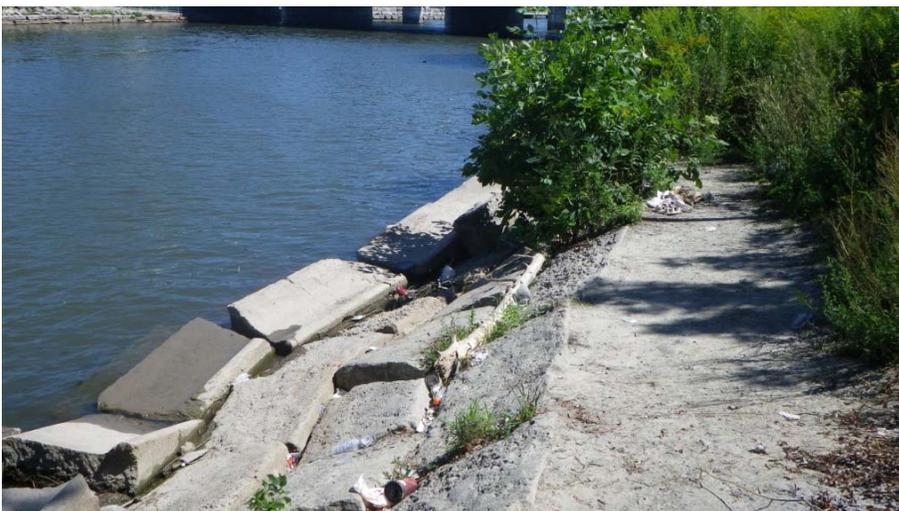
Concrete Slab Shore Treatment along Memorial Park (West)
